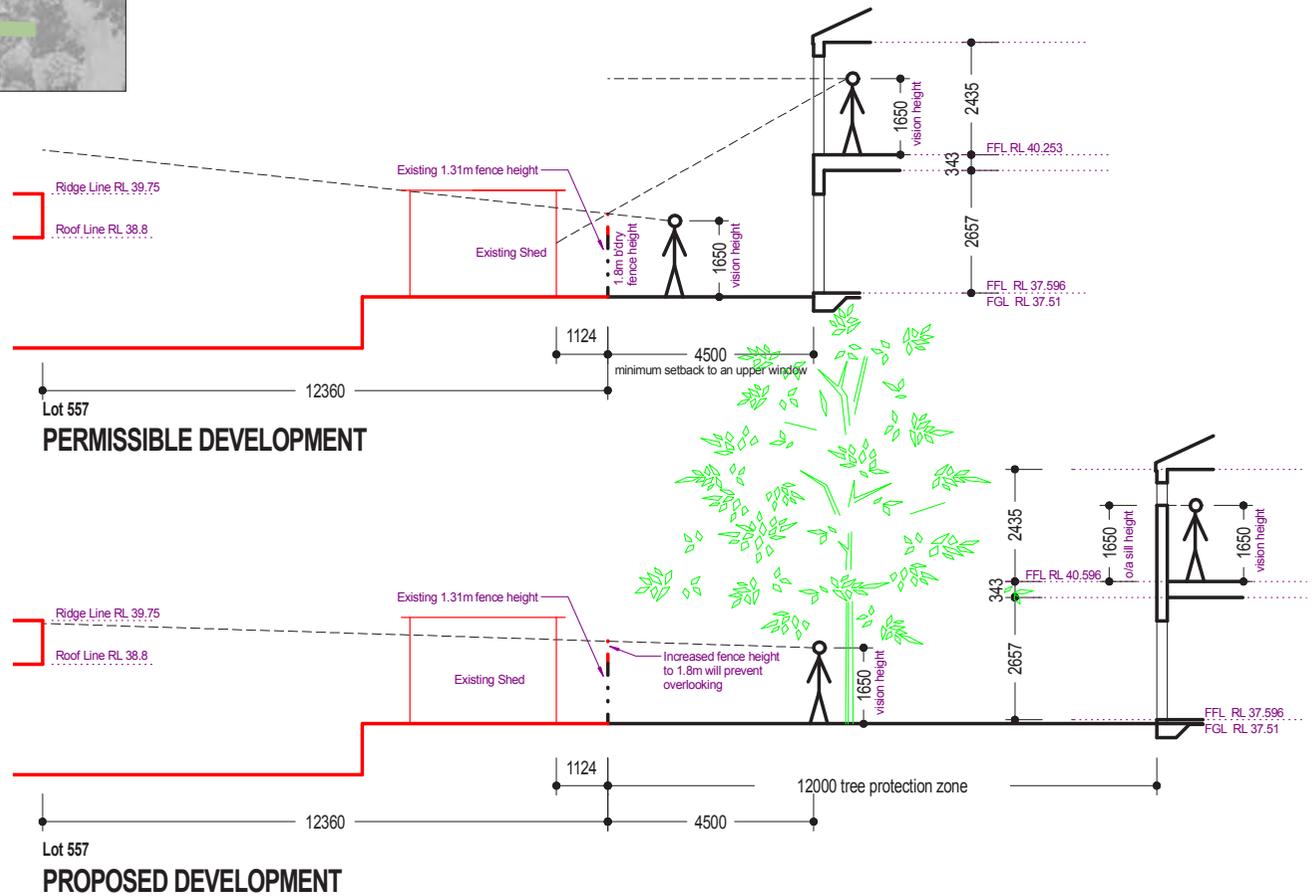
EXISTING RESIDENTIAL INTERFACE - SECTION B
